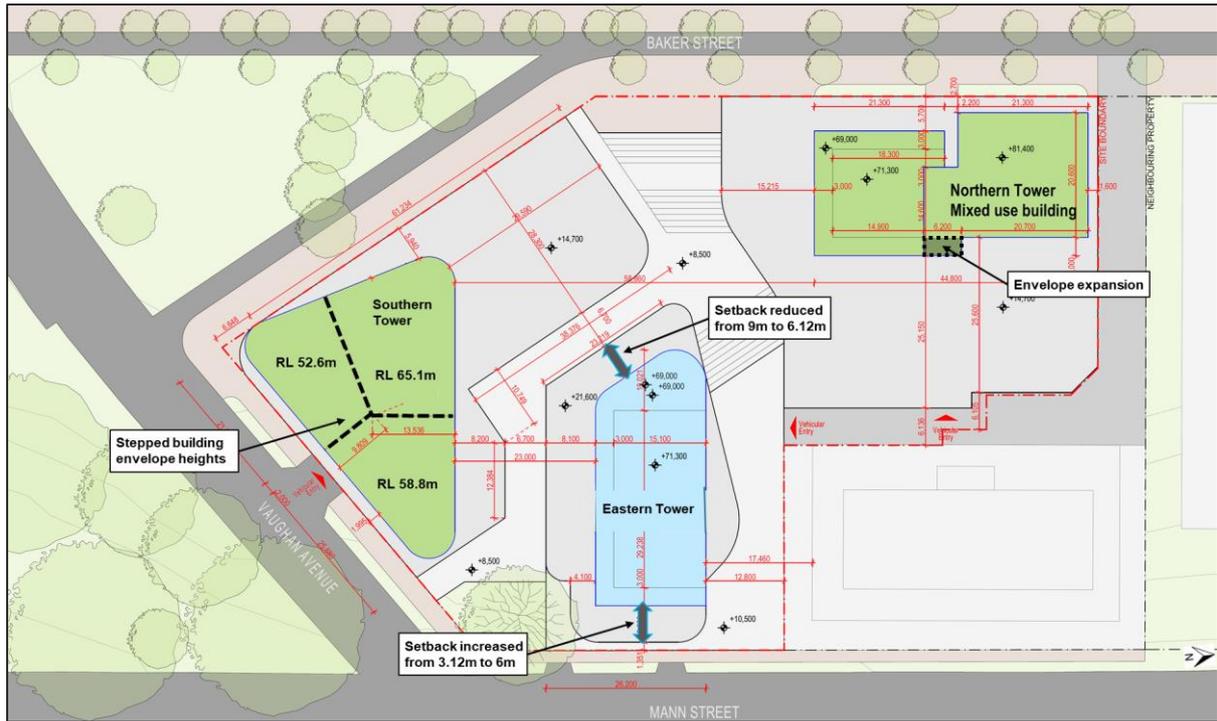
| Proposed building envelope layout, showing stepped building heights of Southern Tower, setbacks to Eastern Tower and expansion of the Northern Tower (Base source: Applicant's RtS)
